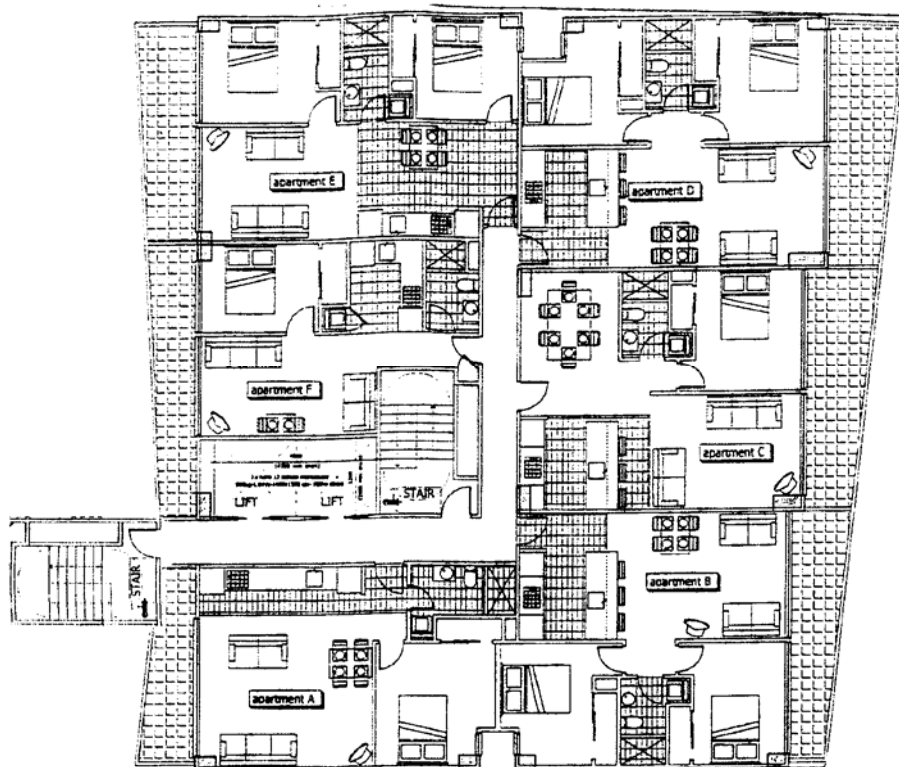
Compliant building – Building C³. (Note additional stairwell lower left)
